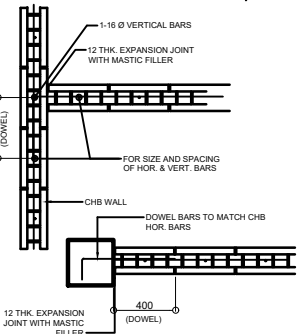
INTERSECTING R.C. COLUMN OR WALL
